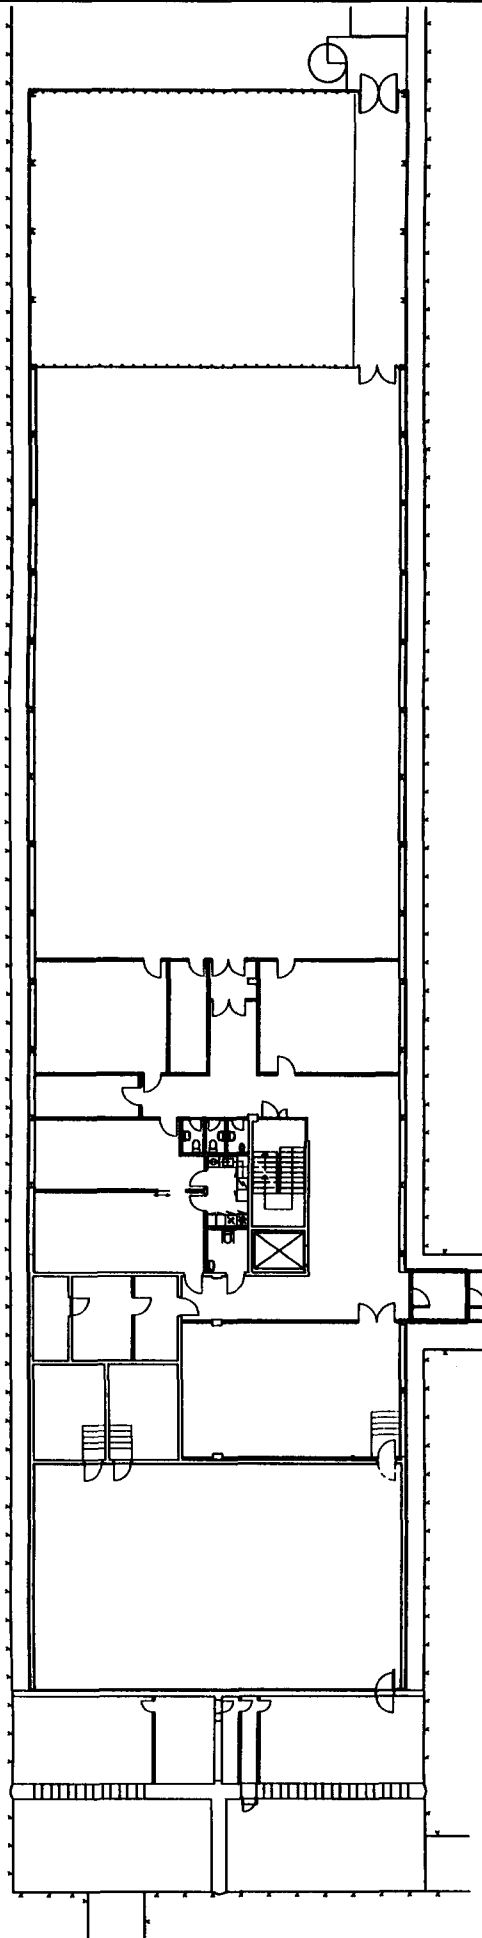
Underground building level 1 of the Oslo Air Traffic Control Centre.
